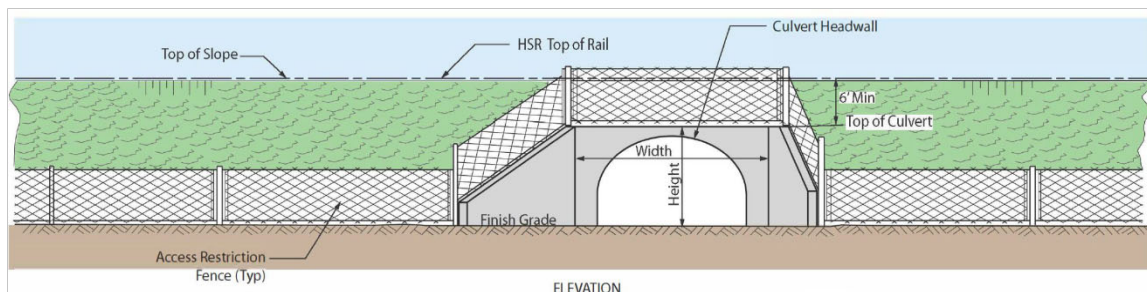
Typical Cross Section of Wildlife Crossing Structure
